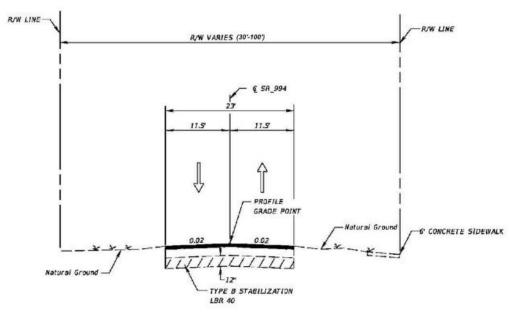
Existing Typical Section SR-994 from SW 137 Ave to SW 127 Ave
